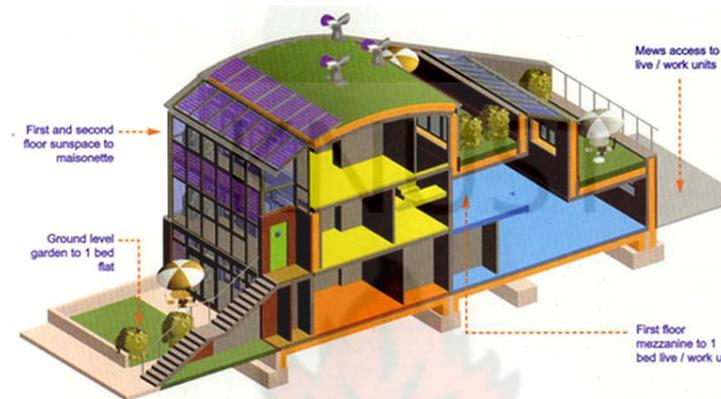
Isometric section through a typical BedZED building. (Source: diagram adopted from BedZED Eco-Village 2008)
